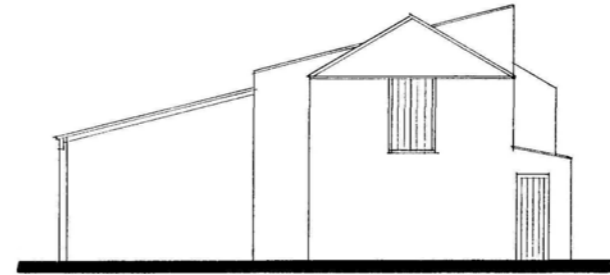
Elevations of Buildings 2-4. Scale 1 to 200.
